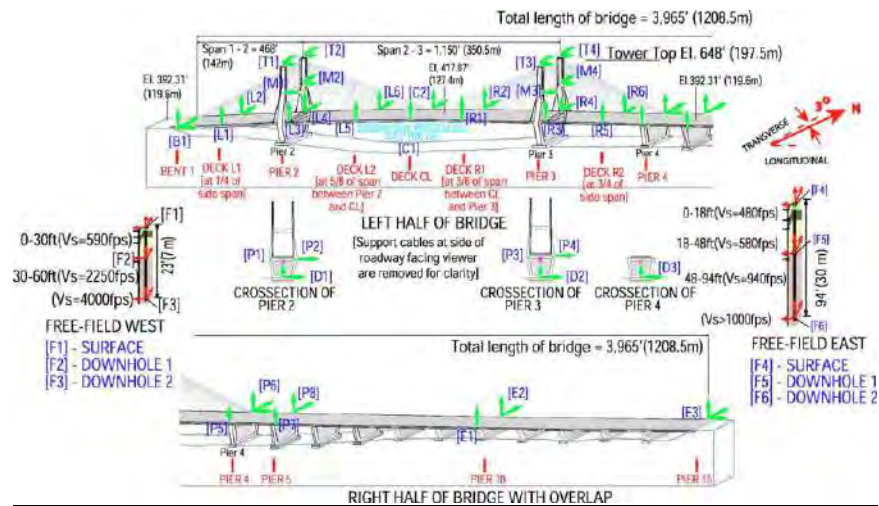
Diagram of instrumentation at Bill Emerson Bridge in Cape Girardeau, MO. Locations and orientation of accelerometers on bridge, towers, and piers are shown. Arrows indicate an accelerometer channel and its orientation. From Çelebi (2006).
